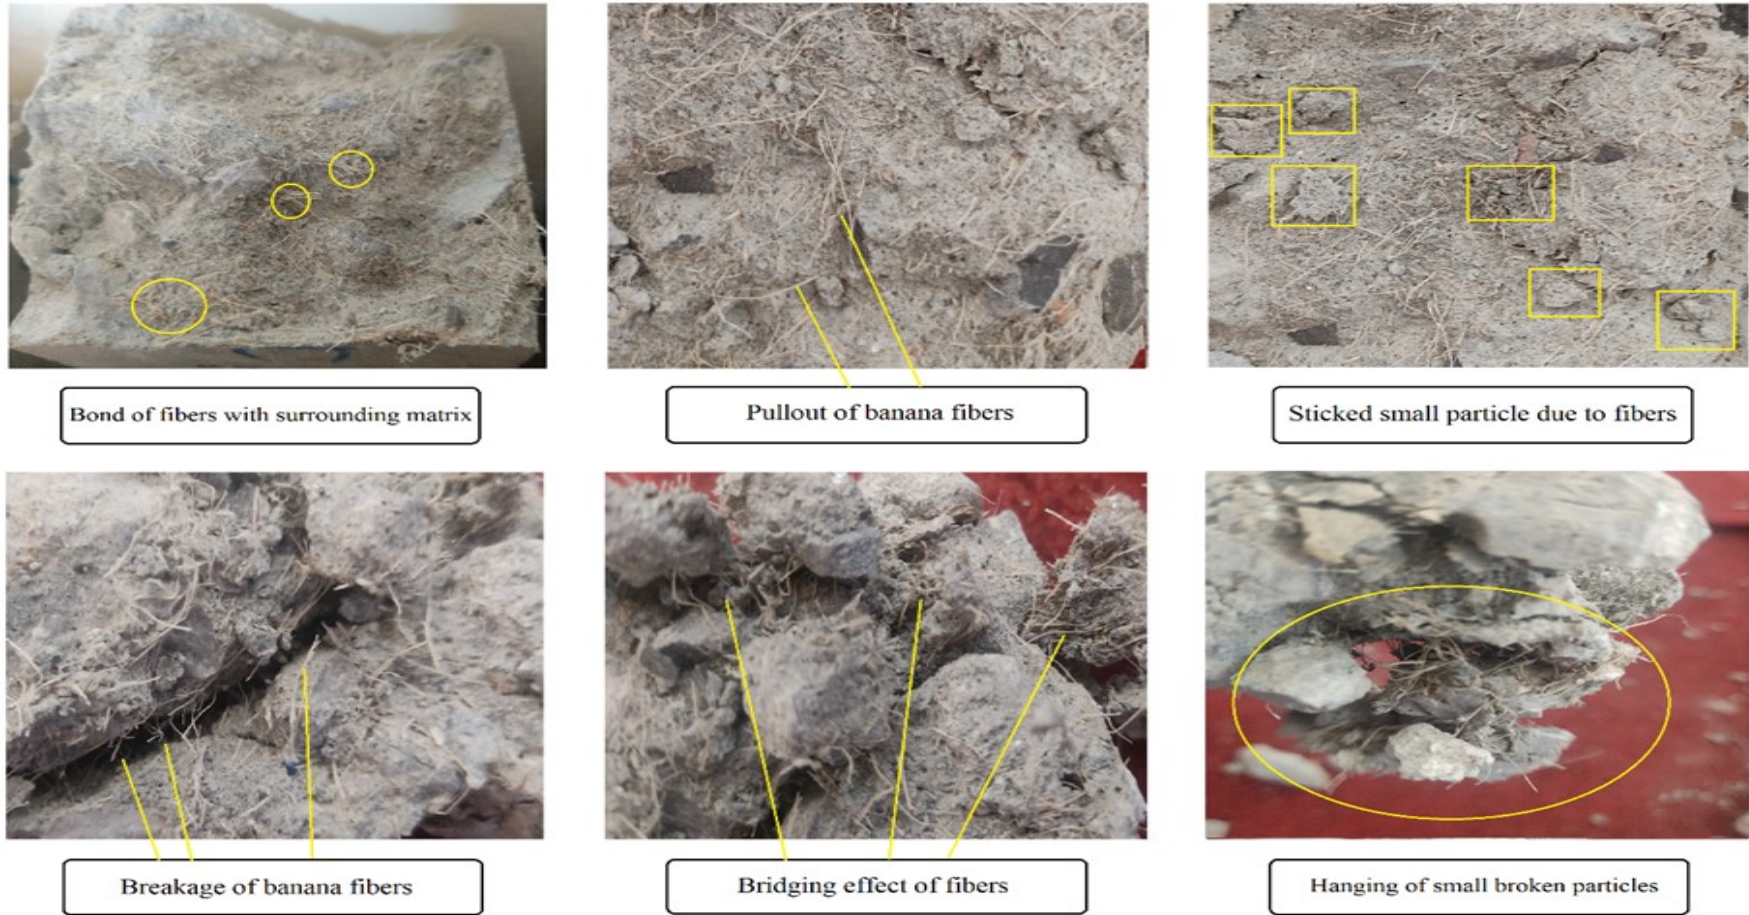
Fractured Surfaces of Different Tested Specimens
